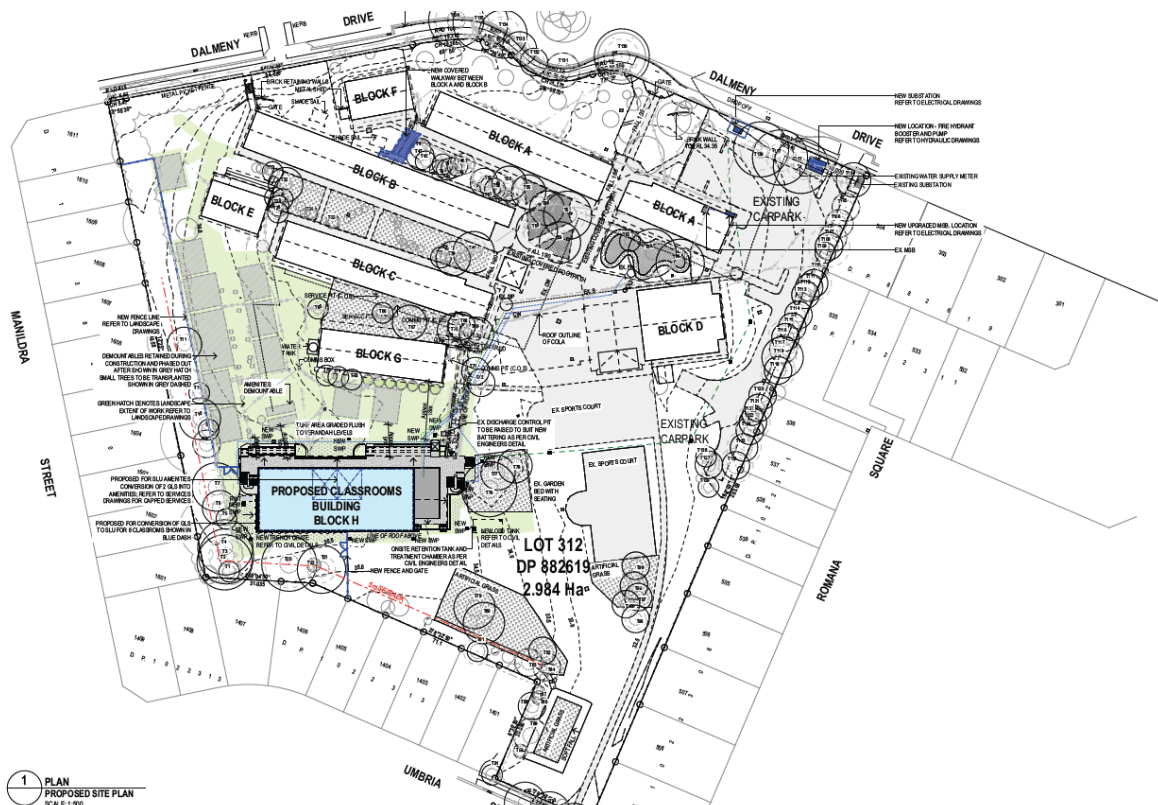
Proposed Site Plan. Source: Fulton Trotter Architects
